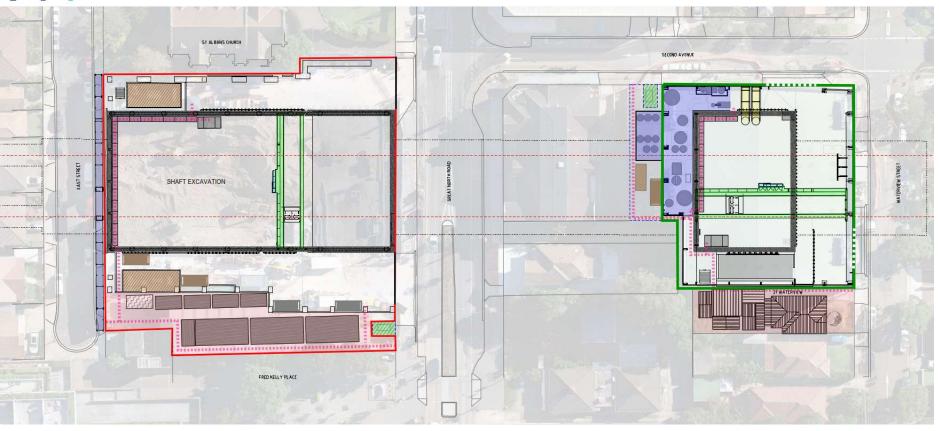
Five Dock west hoarding plan (red) and east acoustic shed (green).
